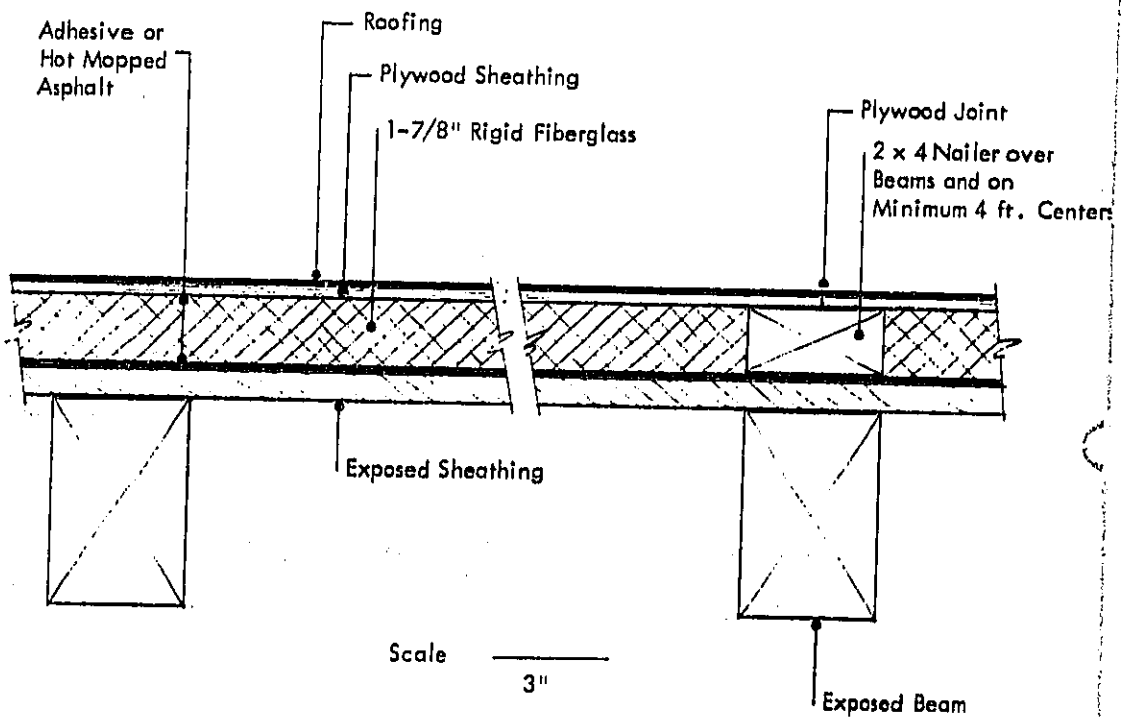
EXPOSED BEAM CEILING - STAGE 2, STANDARD ROOF
